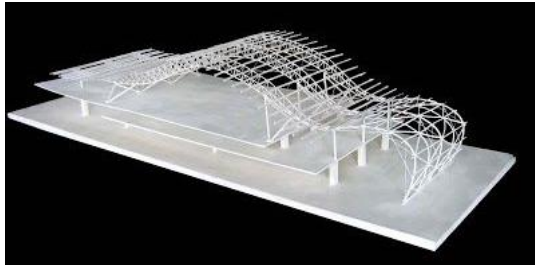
Kansai International Airport Truss Model Source: (Kansai, 2020)
